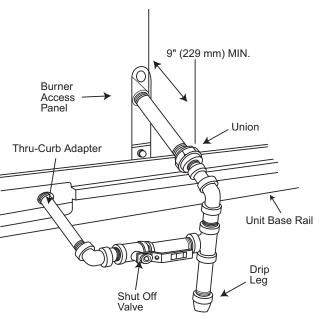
Gas Piping with Thru-Curb Accessory (Alternate Layout)
